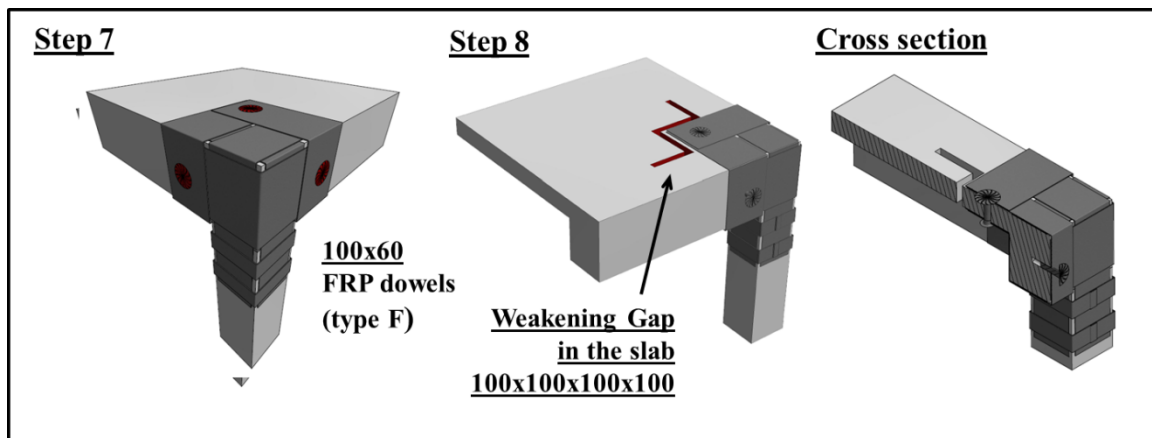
GFRP sequence of application Joint type 2, Steps 7 and 8; cross section showing anchorage details.
